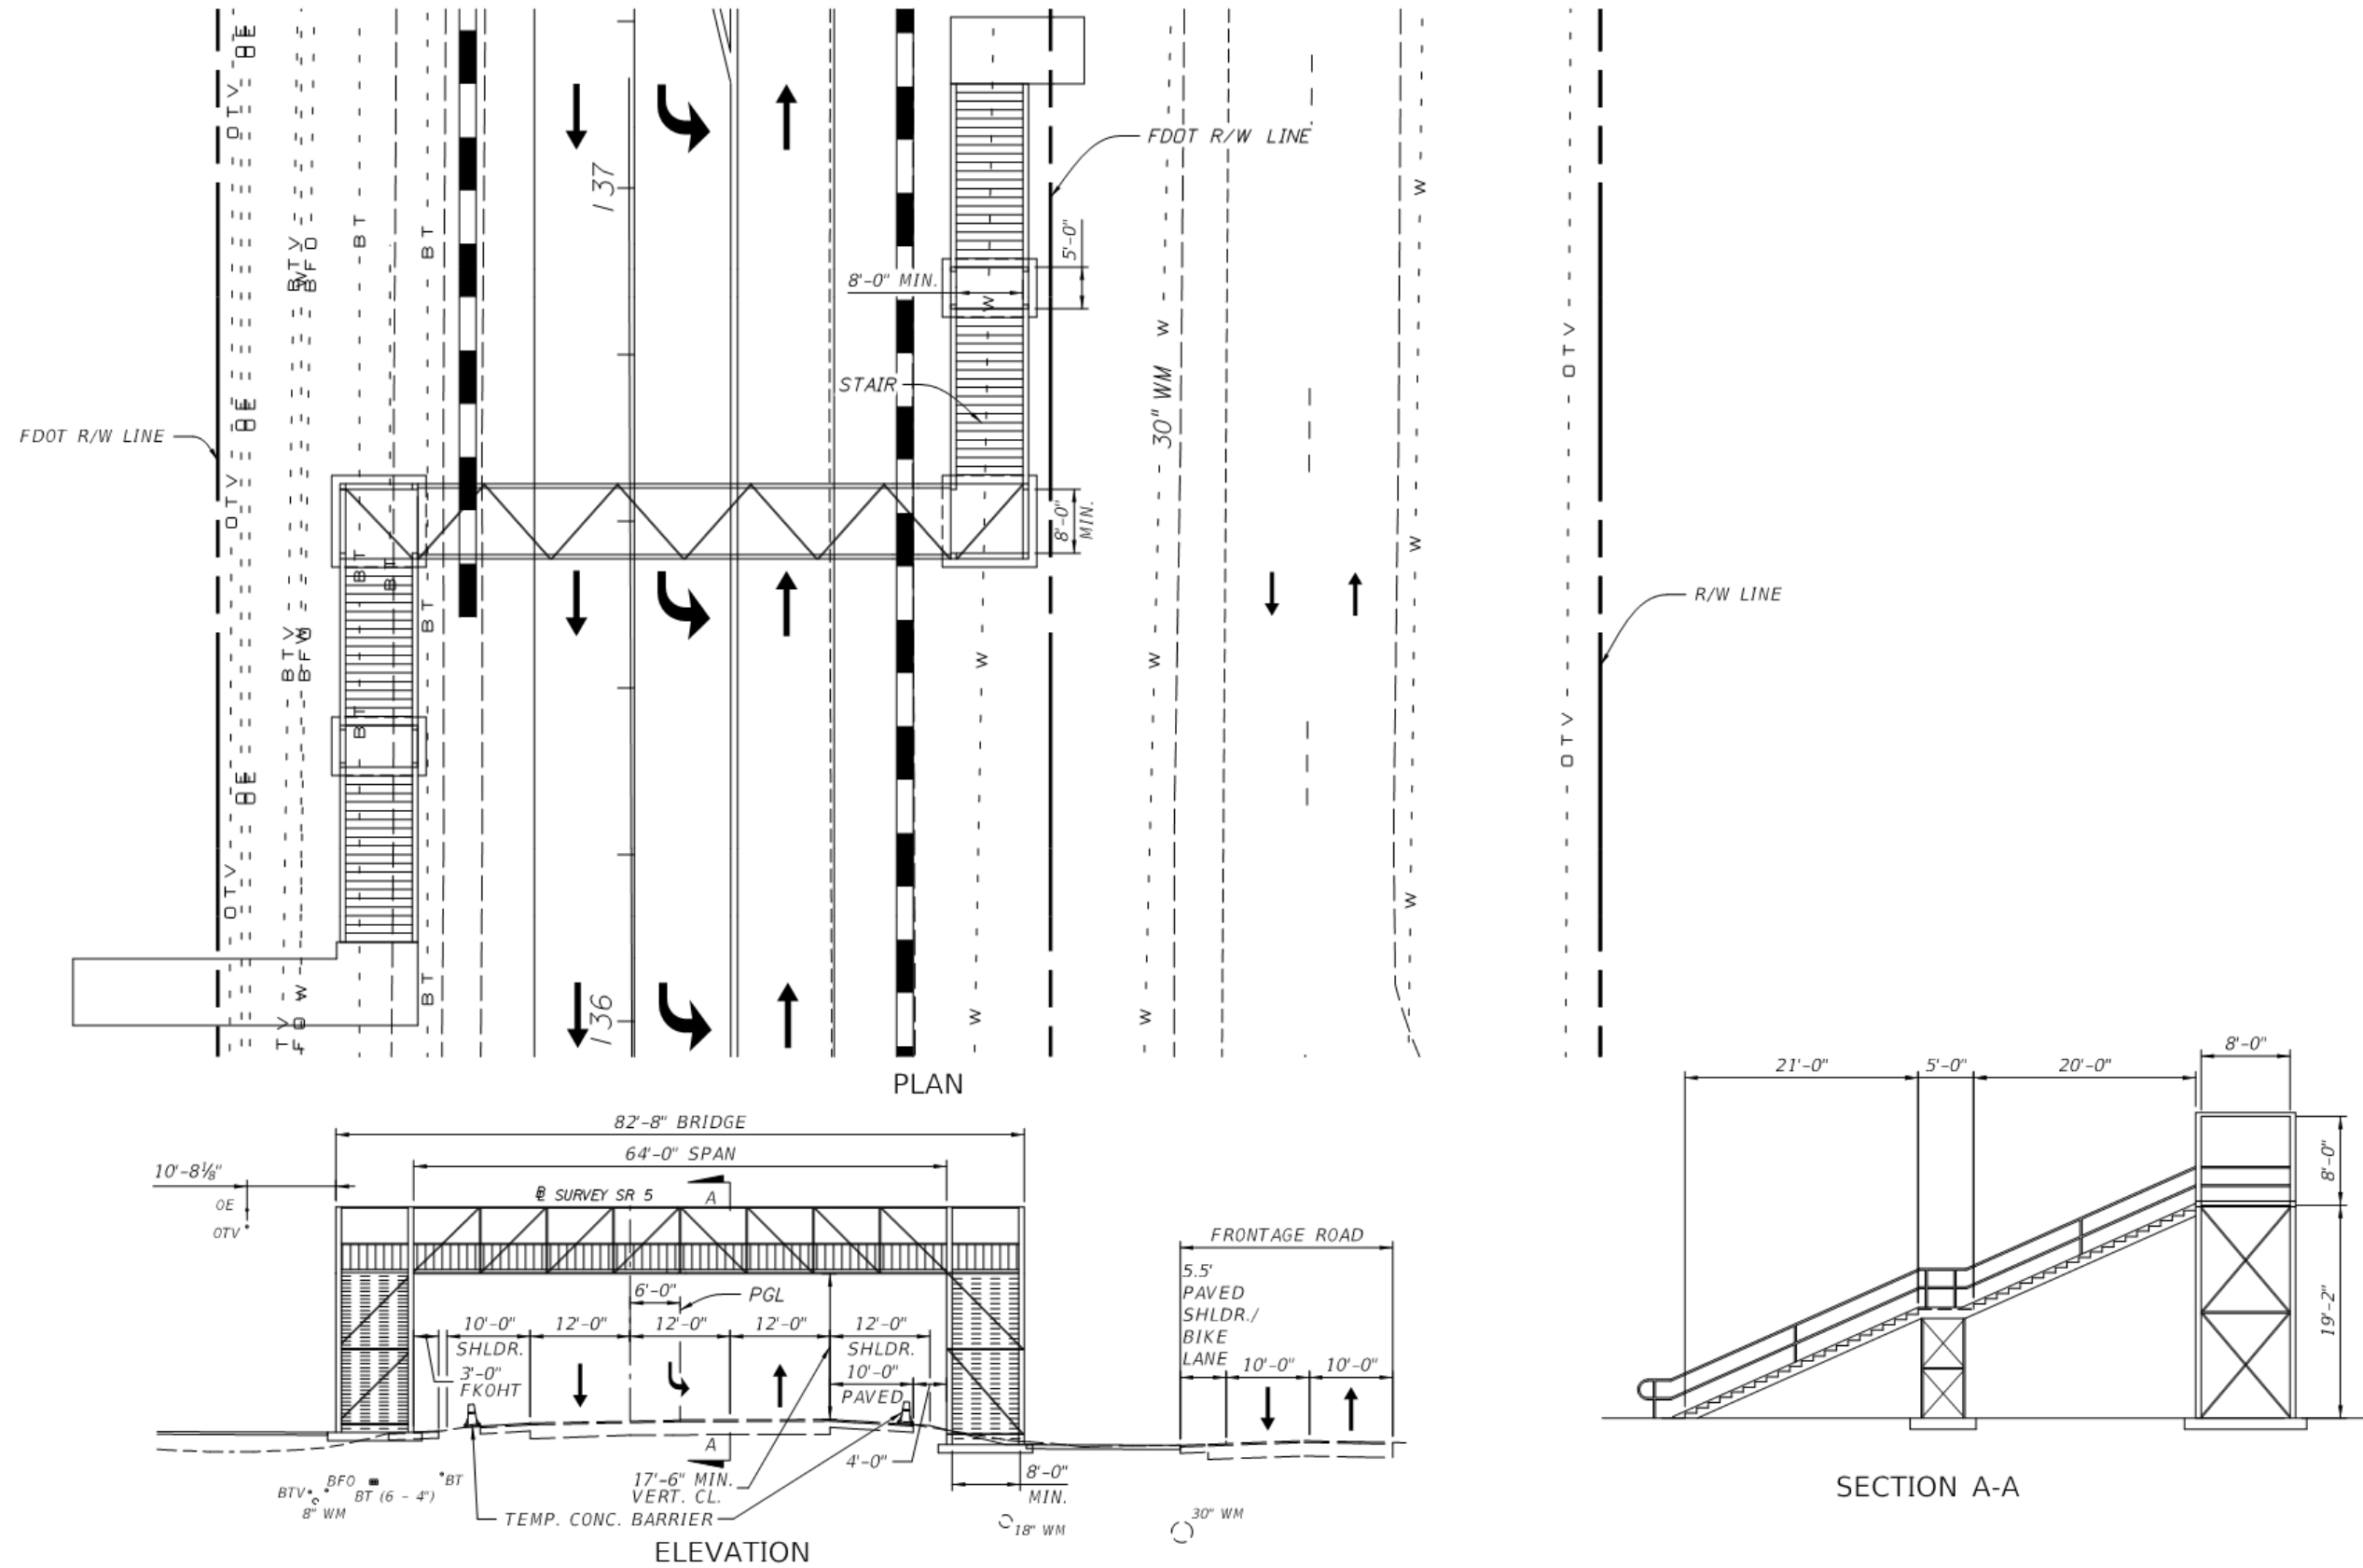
Location 1 Permanent Pedestrian Bridge Concept – Plan View
